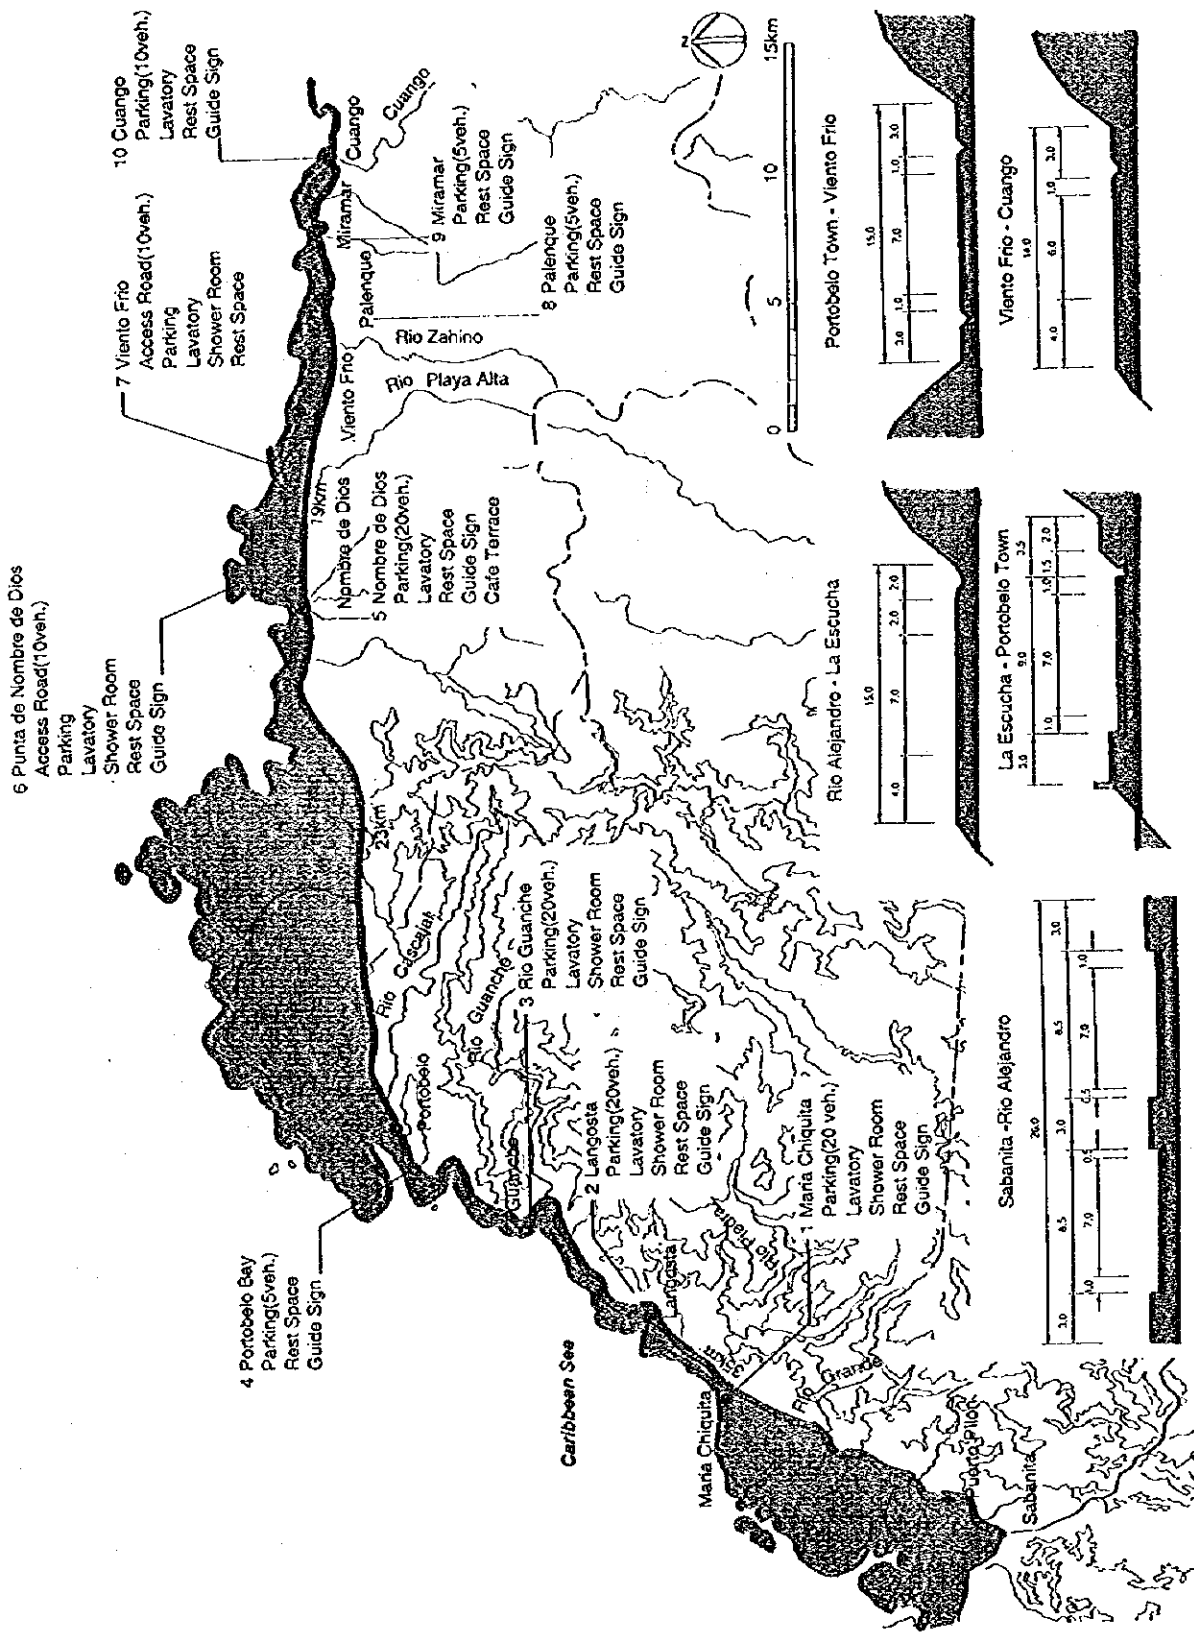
Caribbean Costa Arriba Road Development Plan
